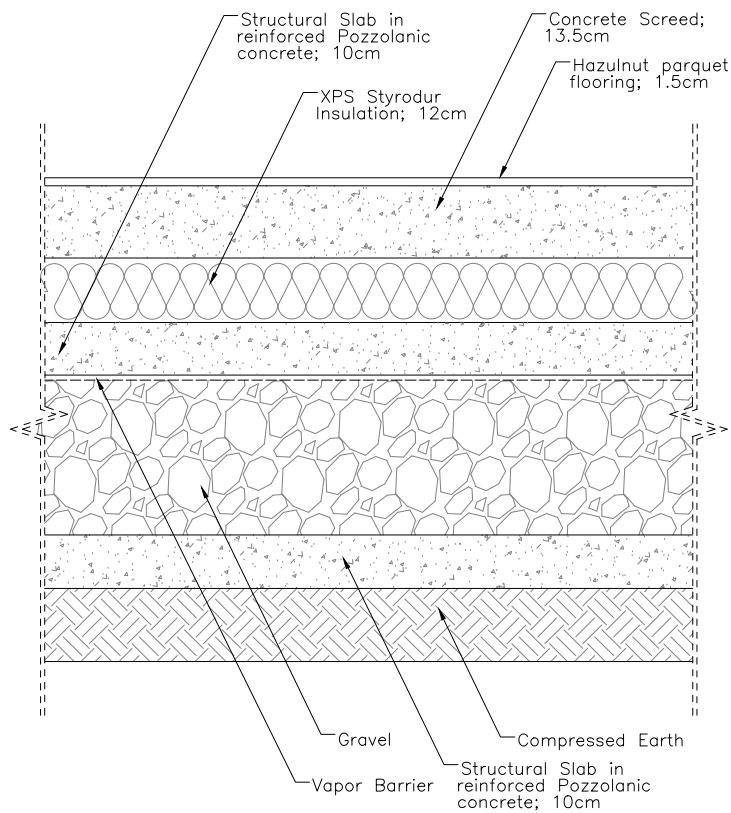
Ground Floor Stratigraphy. Reference: Author.
